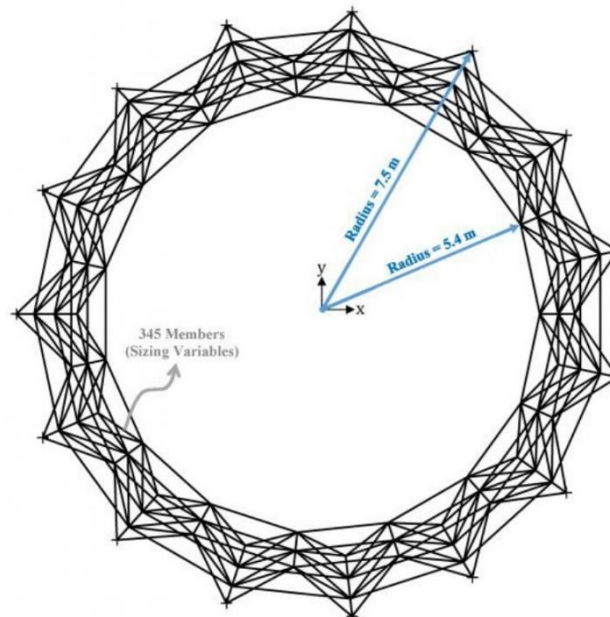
Geometry of the 345-Member Dome Truss Structure (ISCSO_2021 Benchmark Problem)
